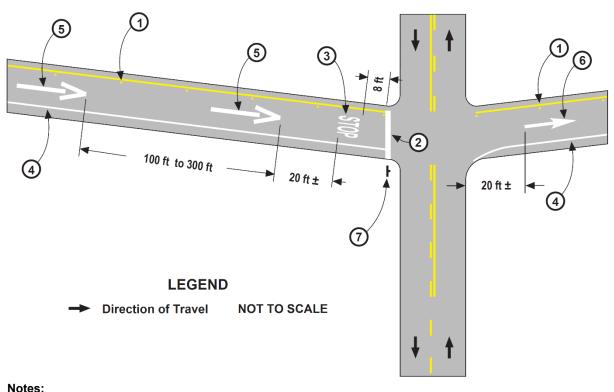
B-21 (CA). Figure 3B-24 (CA). Examples of Standard Arrows for Pavement Markings (Sheet 2 of 8)
